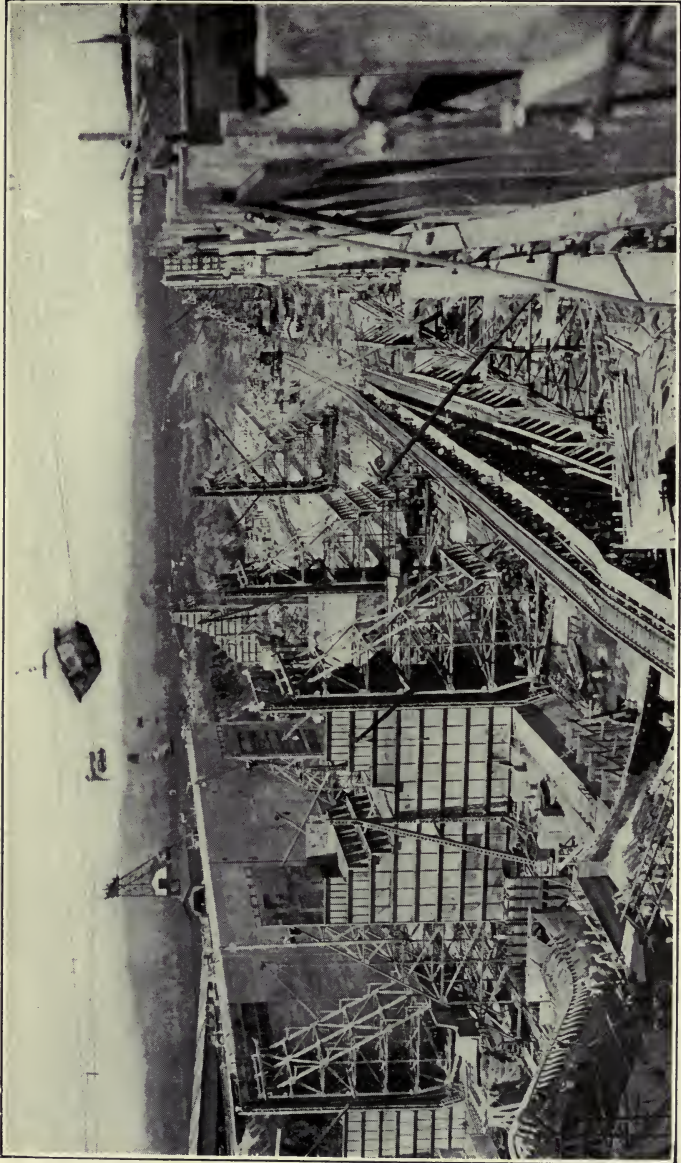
STEEL FORMS, GATUN LOCKS.
